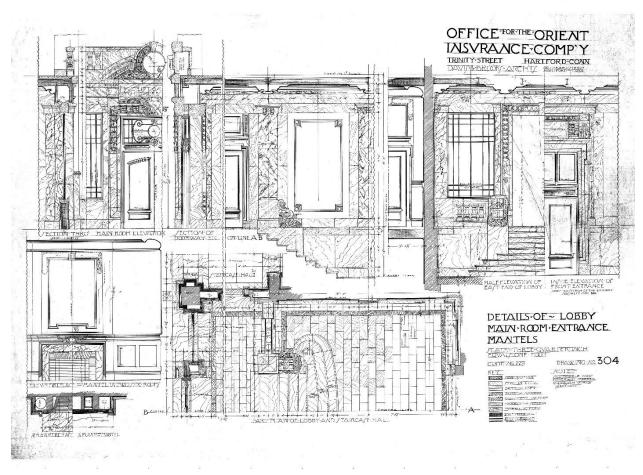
Detail drawing of Original Lobby at 20 Trinity Street.
